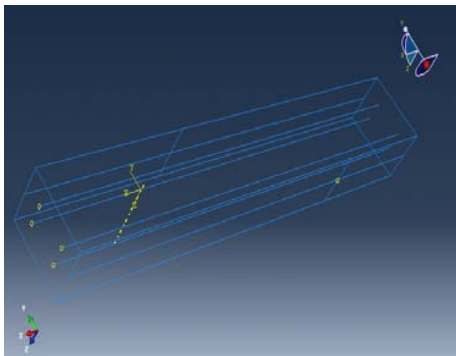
Three dimension finite element model of concrete beam and steel bars by ABAQUS software
